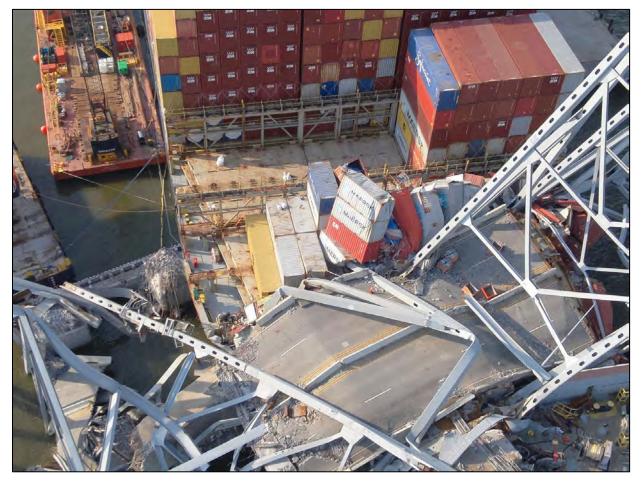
View from above of DALI bow area after collapse (Note the bridge roadbed).
